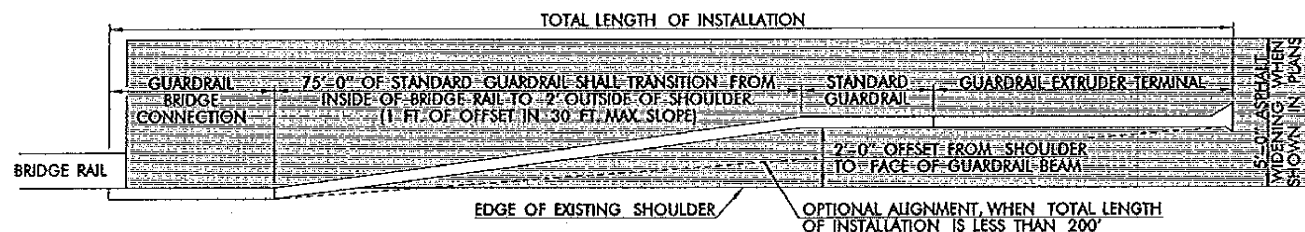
DETAIL OF SHOULDER WIDENING FOR STANDARD GUARDRAIL
